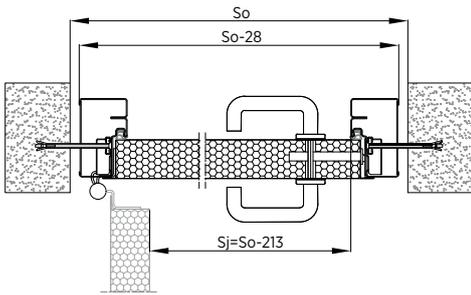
Installation of the single-leaf door to a masonry wall - internal frame with a thermal break - horizontal cross-section
